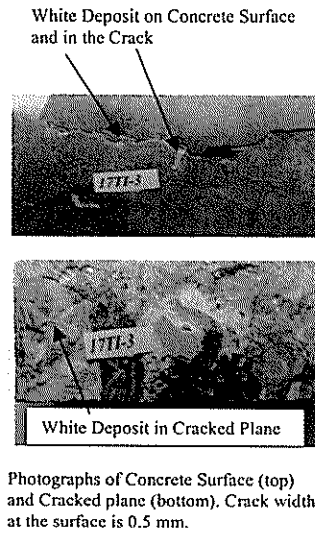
Photographs of a Healed Crack (Top – Concrete Surface, Bottom – Split Open Crack Plane)
